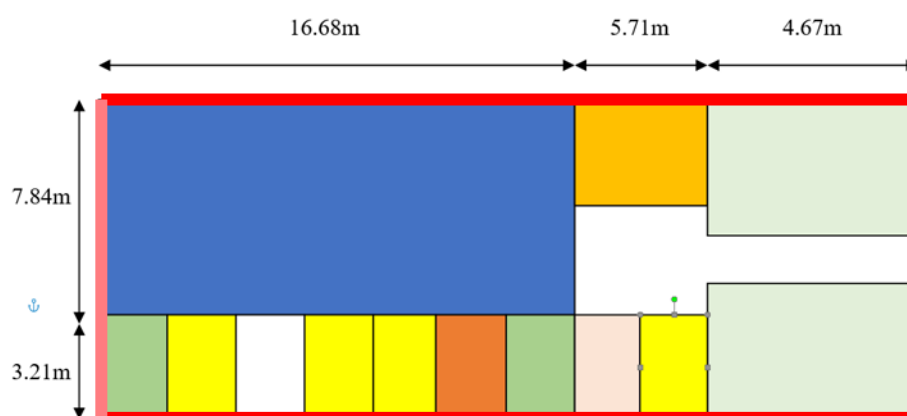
Location of insulations (EWI and IWI) forming thermal envelope of wall structures
